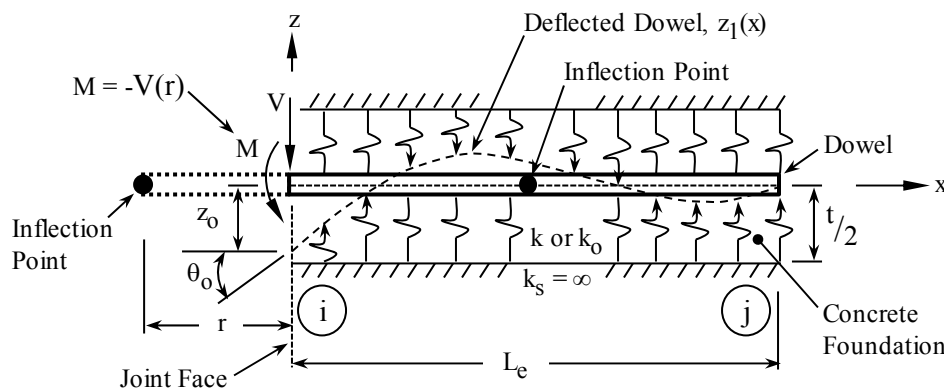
Dowel on concrete elastic foundation (one-parameter model)
